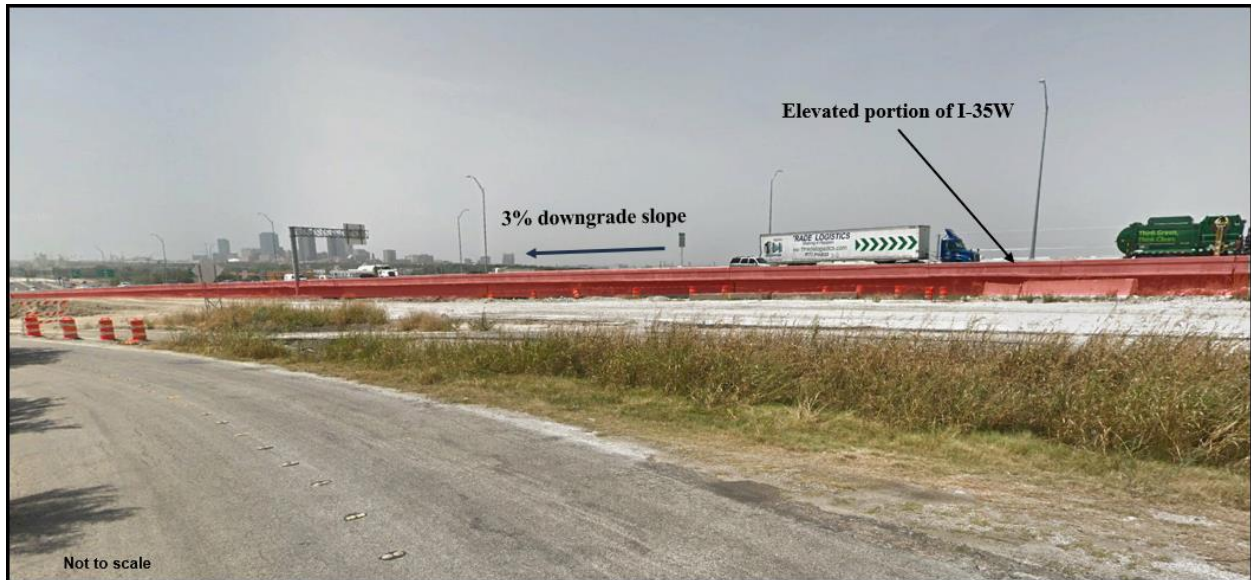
View of 3% downgrade slope of the elevated portion of I-35W, highlighted in red, prior to the crash location looking to the southwest (Source: Google Earth Street view image, revised).
